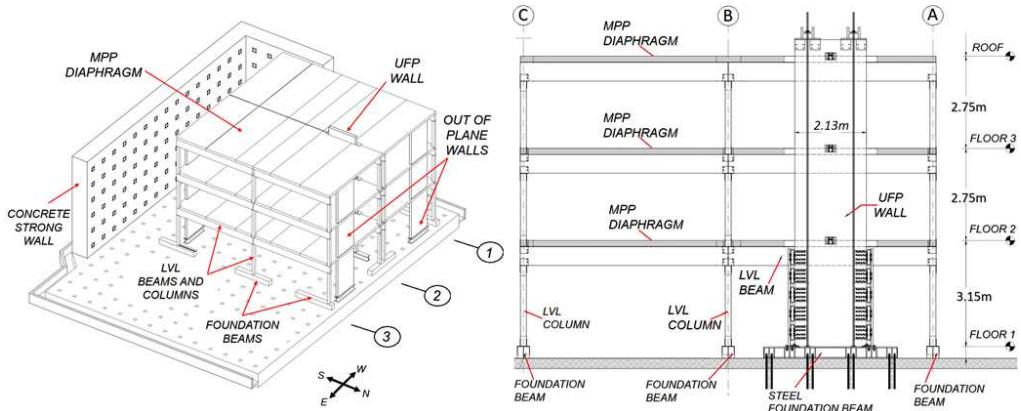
(a) 3D Revit model for the three-story building, (b) Elevation of axis 2.
